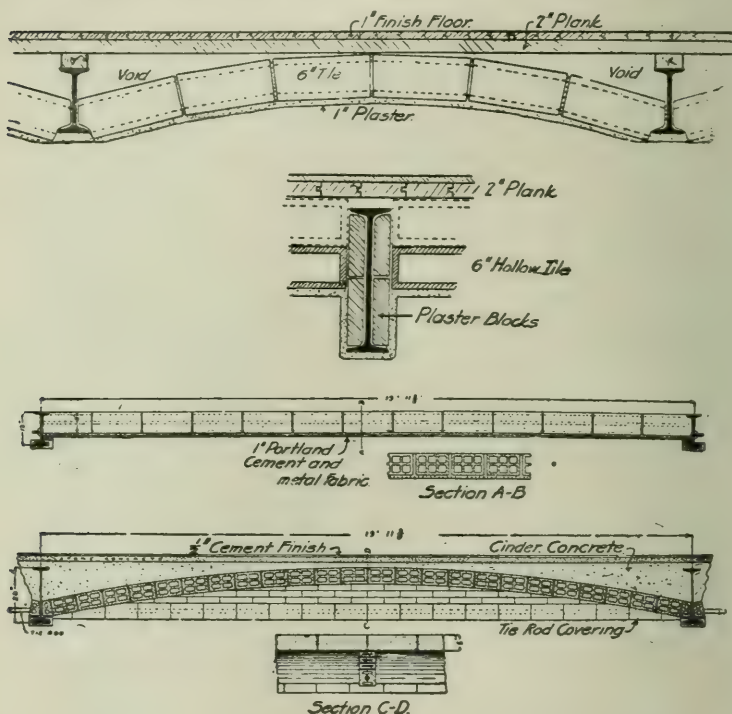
Method of using 1 inch of Portland Cement Plaster on Exposed Surface of Clay Tile Fireproofing. Does not Repair Defects in Clay Tile.
